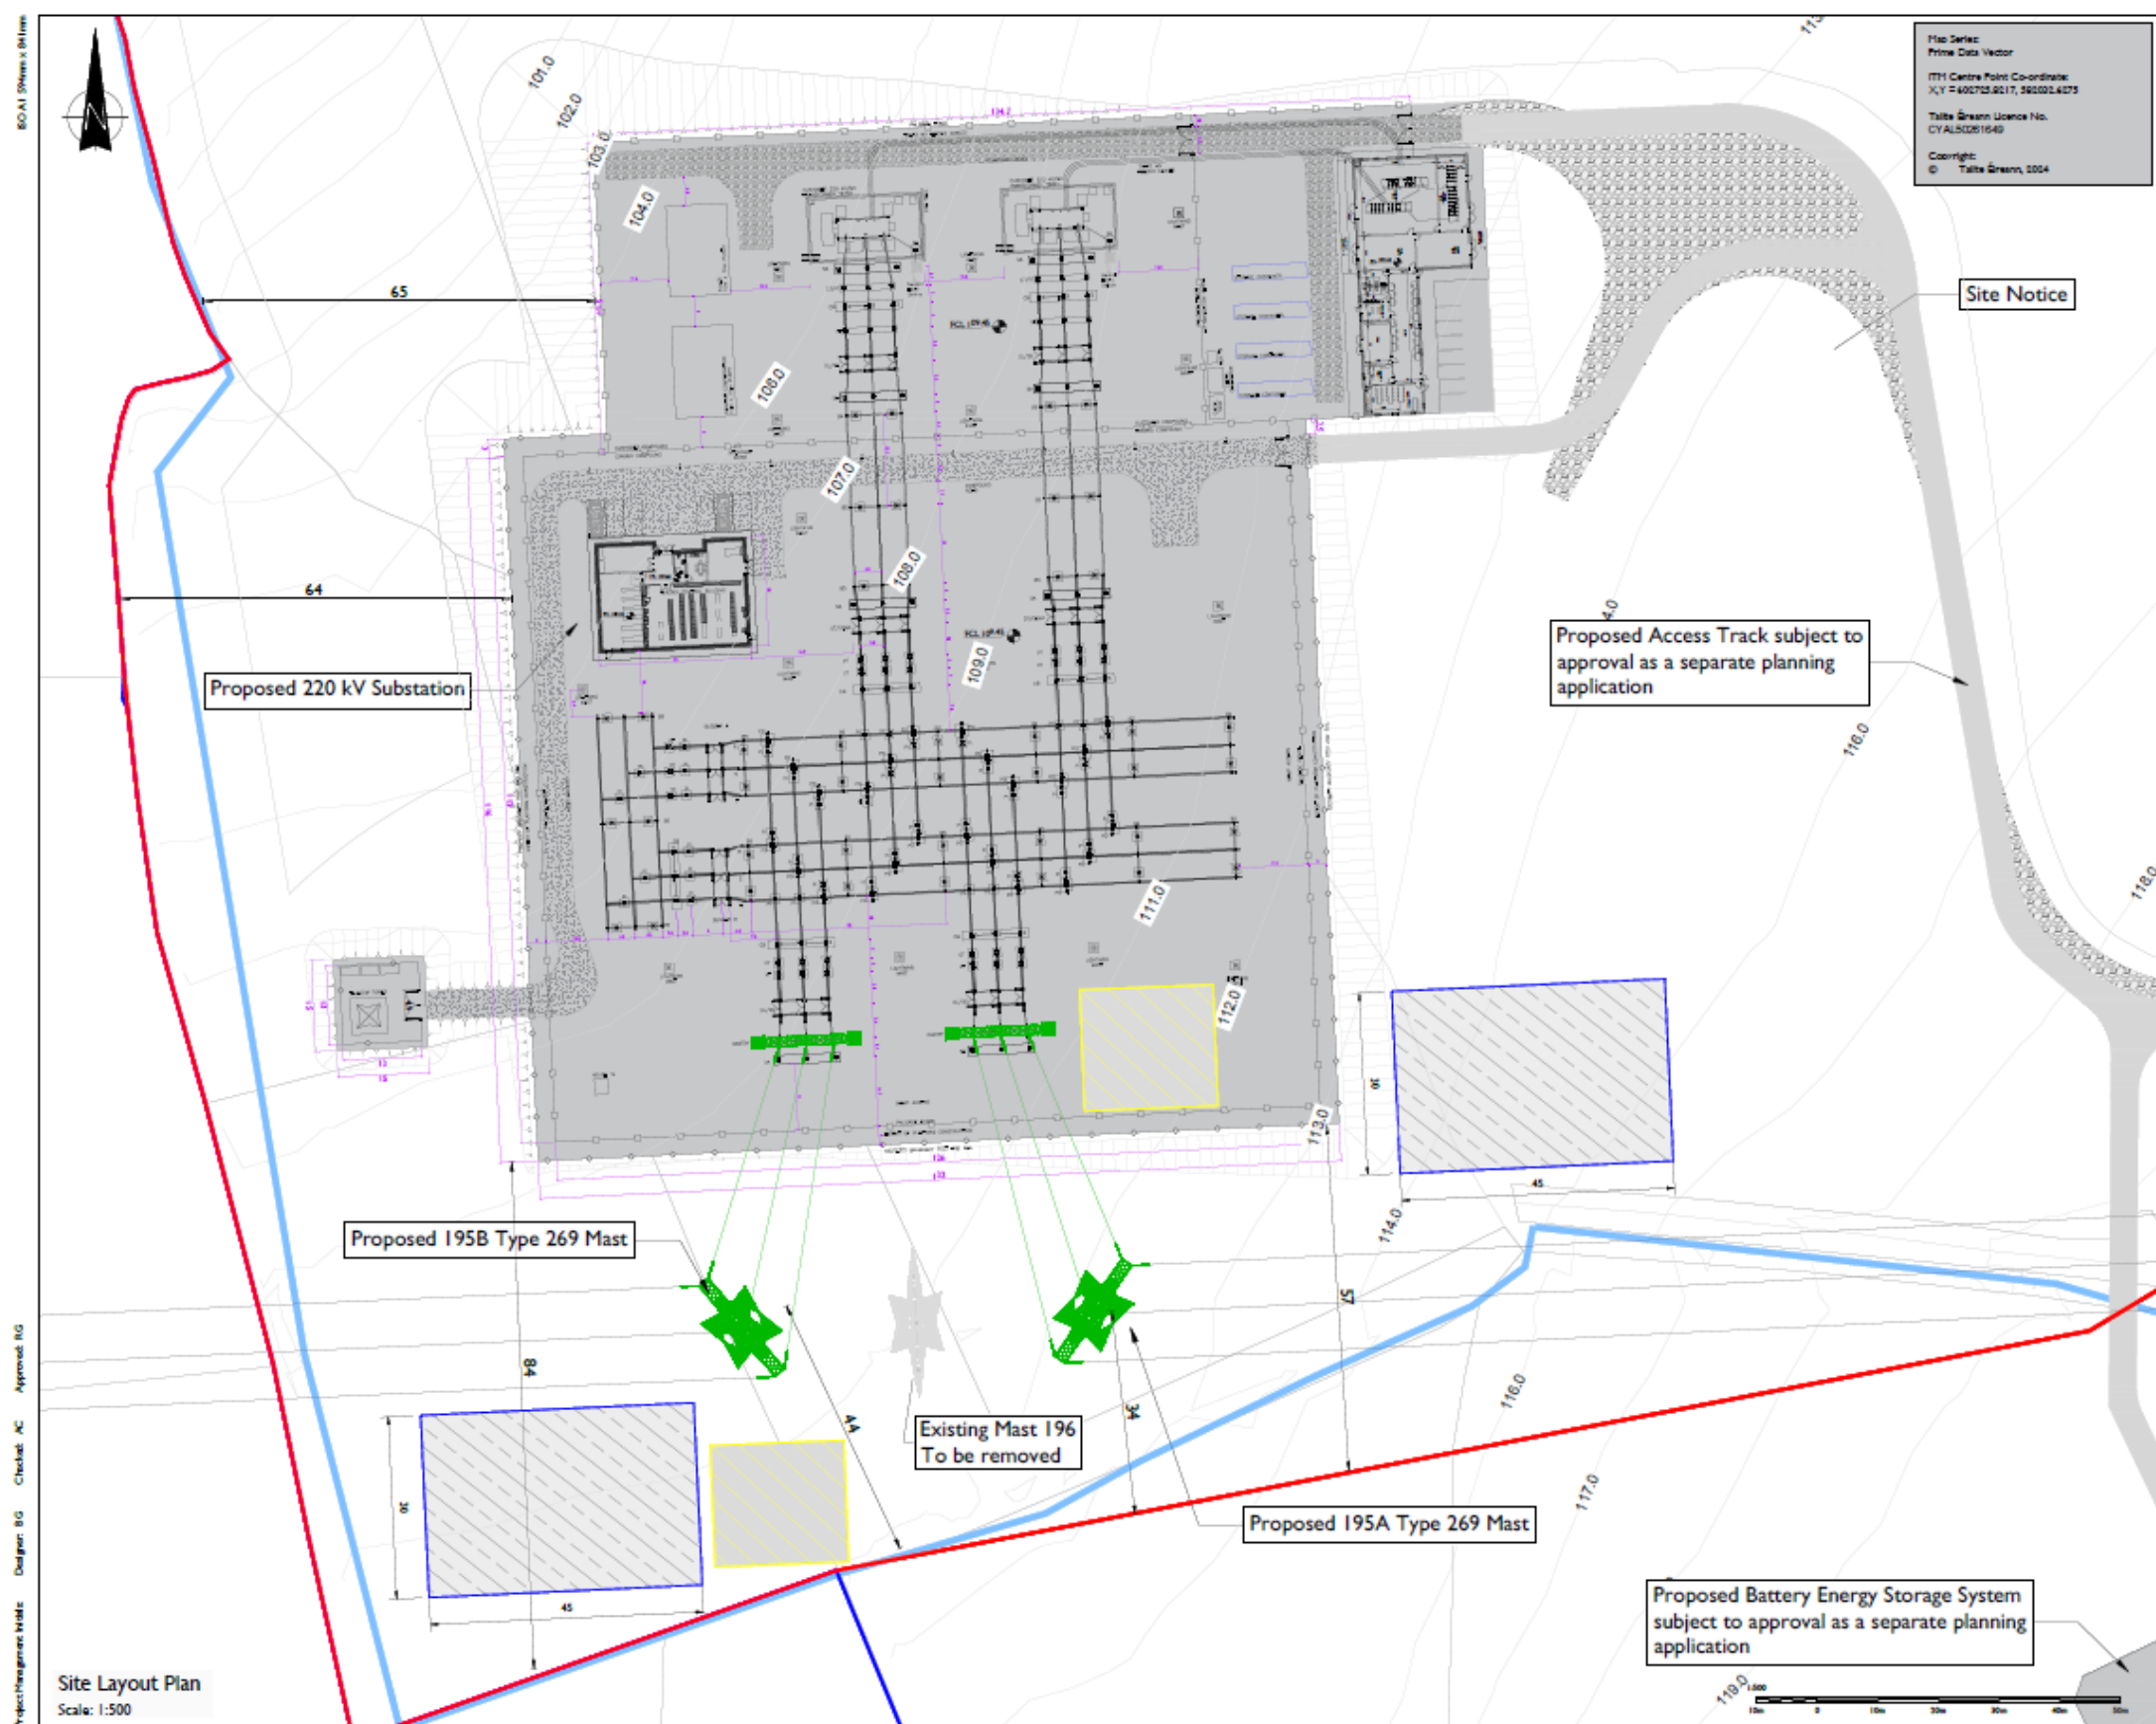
220kV AIS Substation Layout Plan and Loop in Connection (illustrative purposes only)
